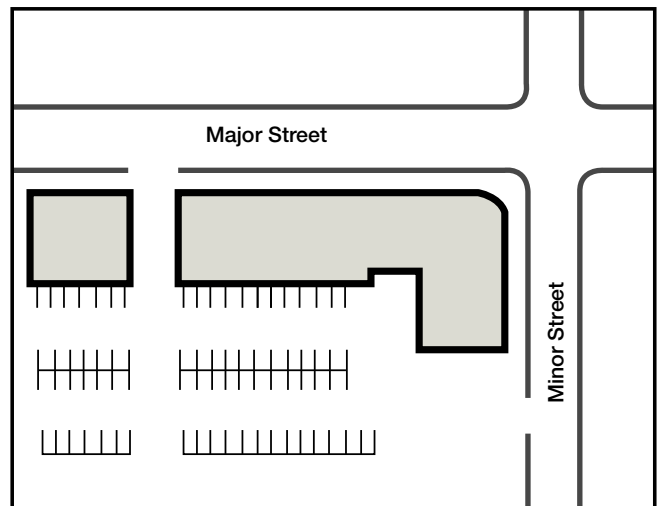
Preferred Parking Lot Layout to Create Street Wall Along State Street
